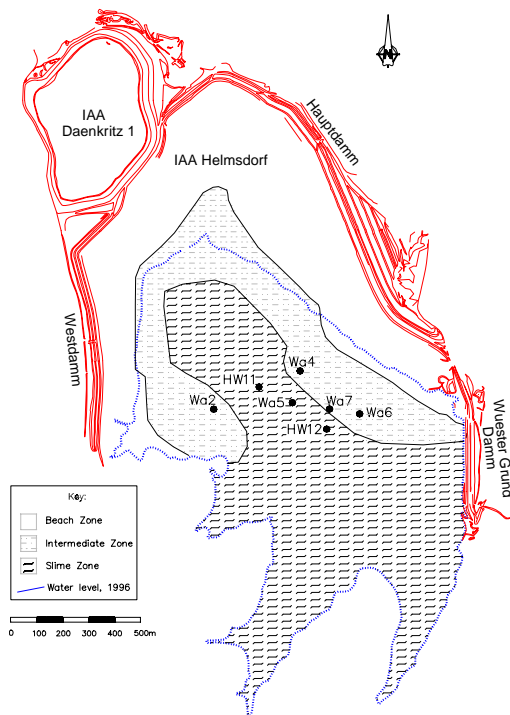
Site plan for Helmsdorf tailings impoundment.
